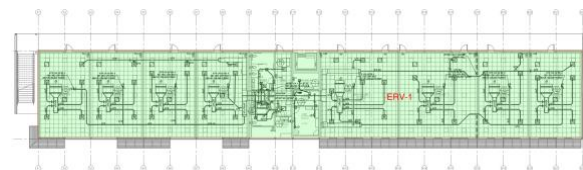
EXAMPLE FLOOR PLAN OF ONE DOAS VENTILATION ZONE FOR ENTIRE BUILDING
